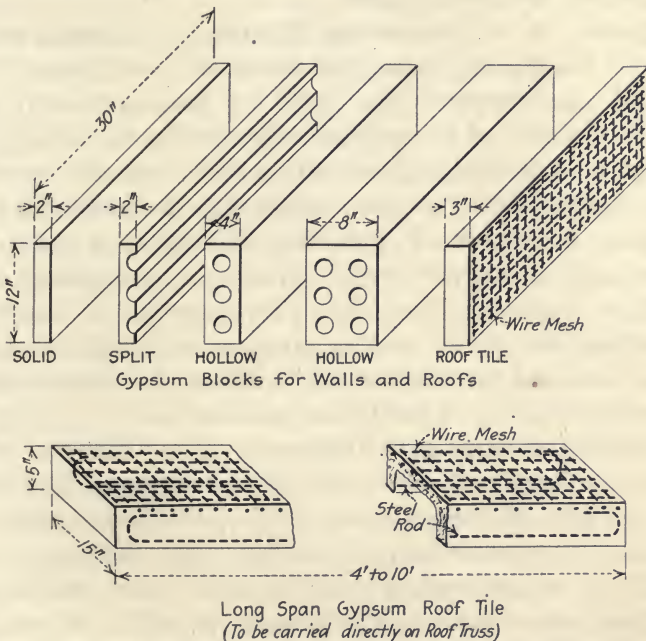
Typical forms of gypsum blocks and gypsum tile.
